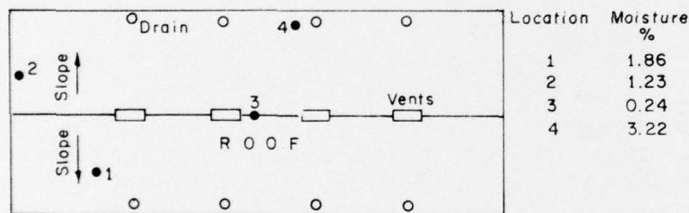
Roof plan of building 1053, Fort Wainwright, Alaska.
